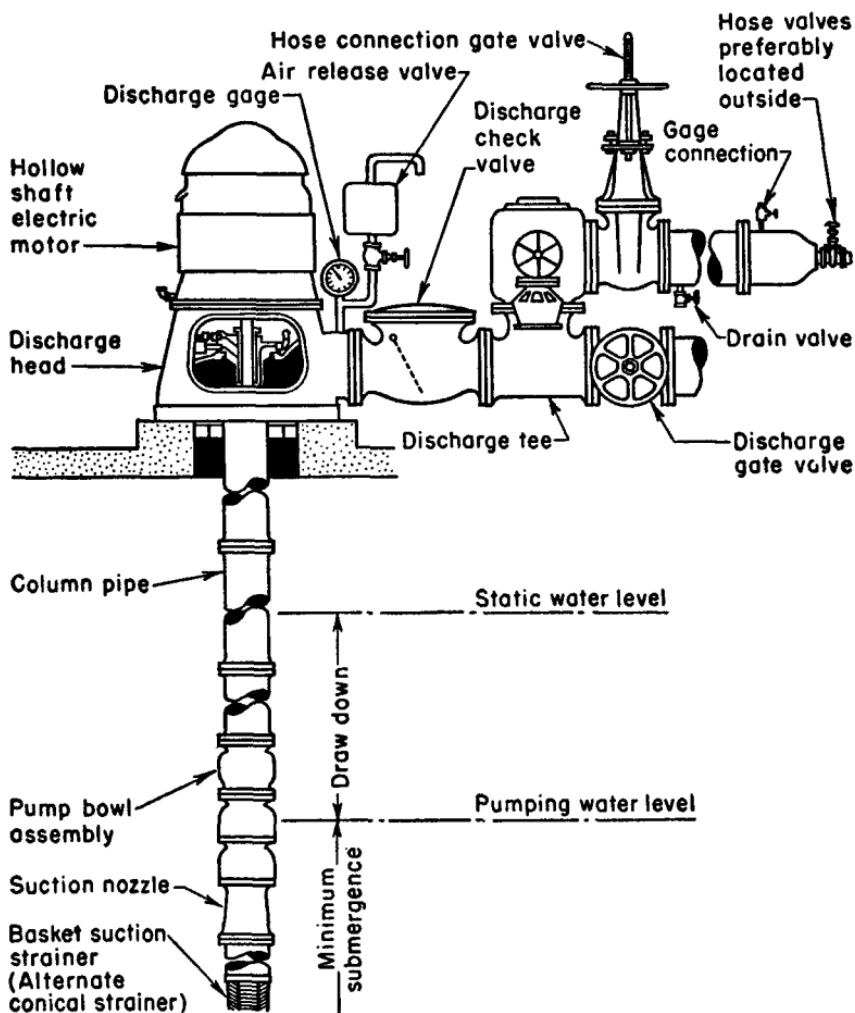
Vertical Shaft Turbine-Type Pump Installation.
